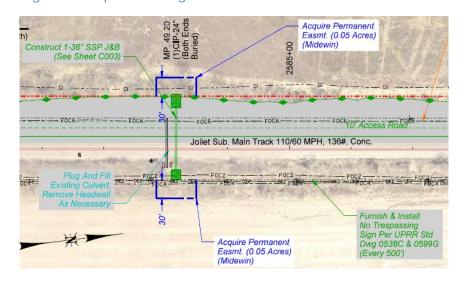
Proposed Design of Culvert under the Tracks at MNTP
